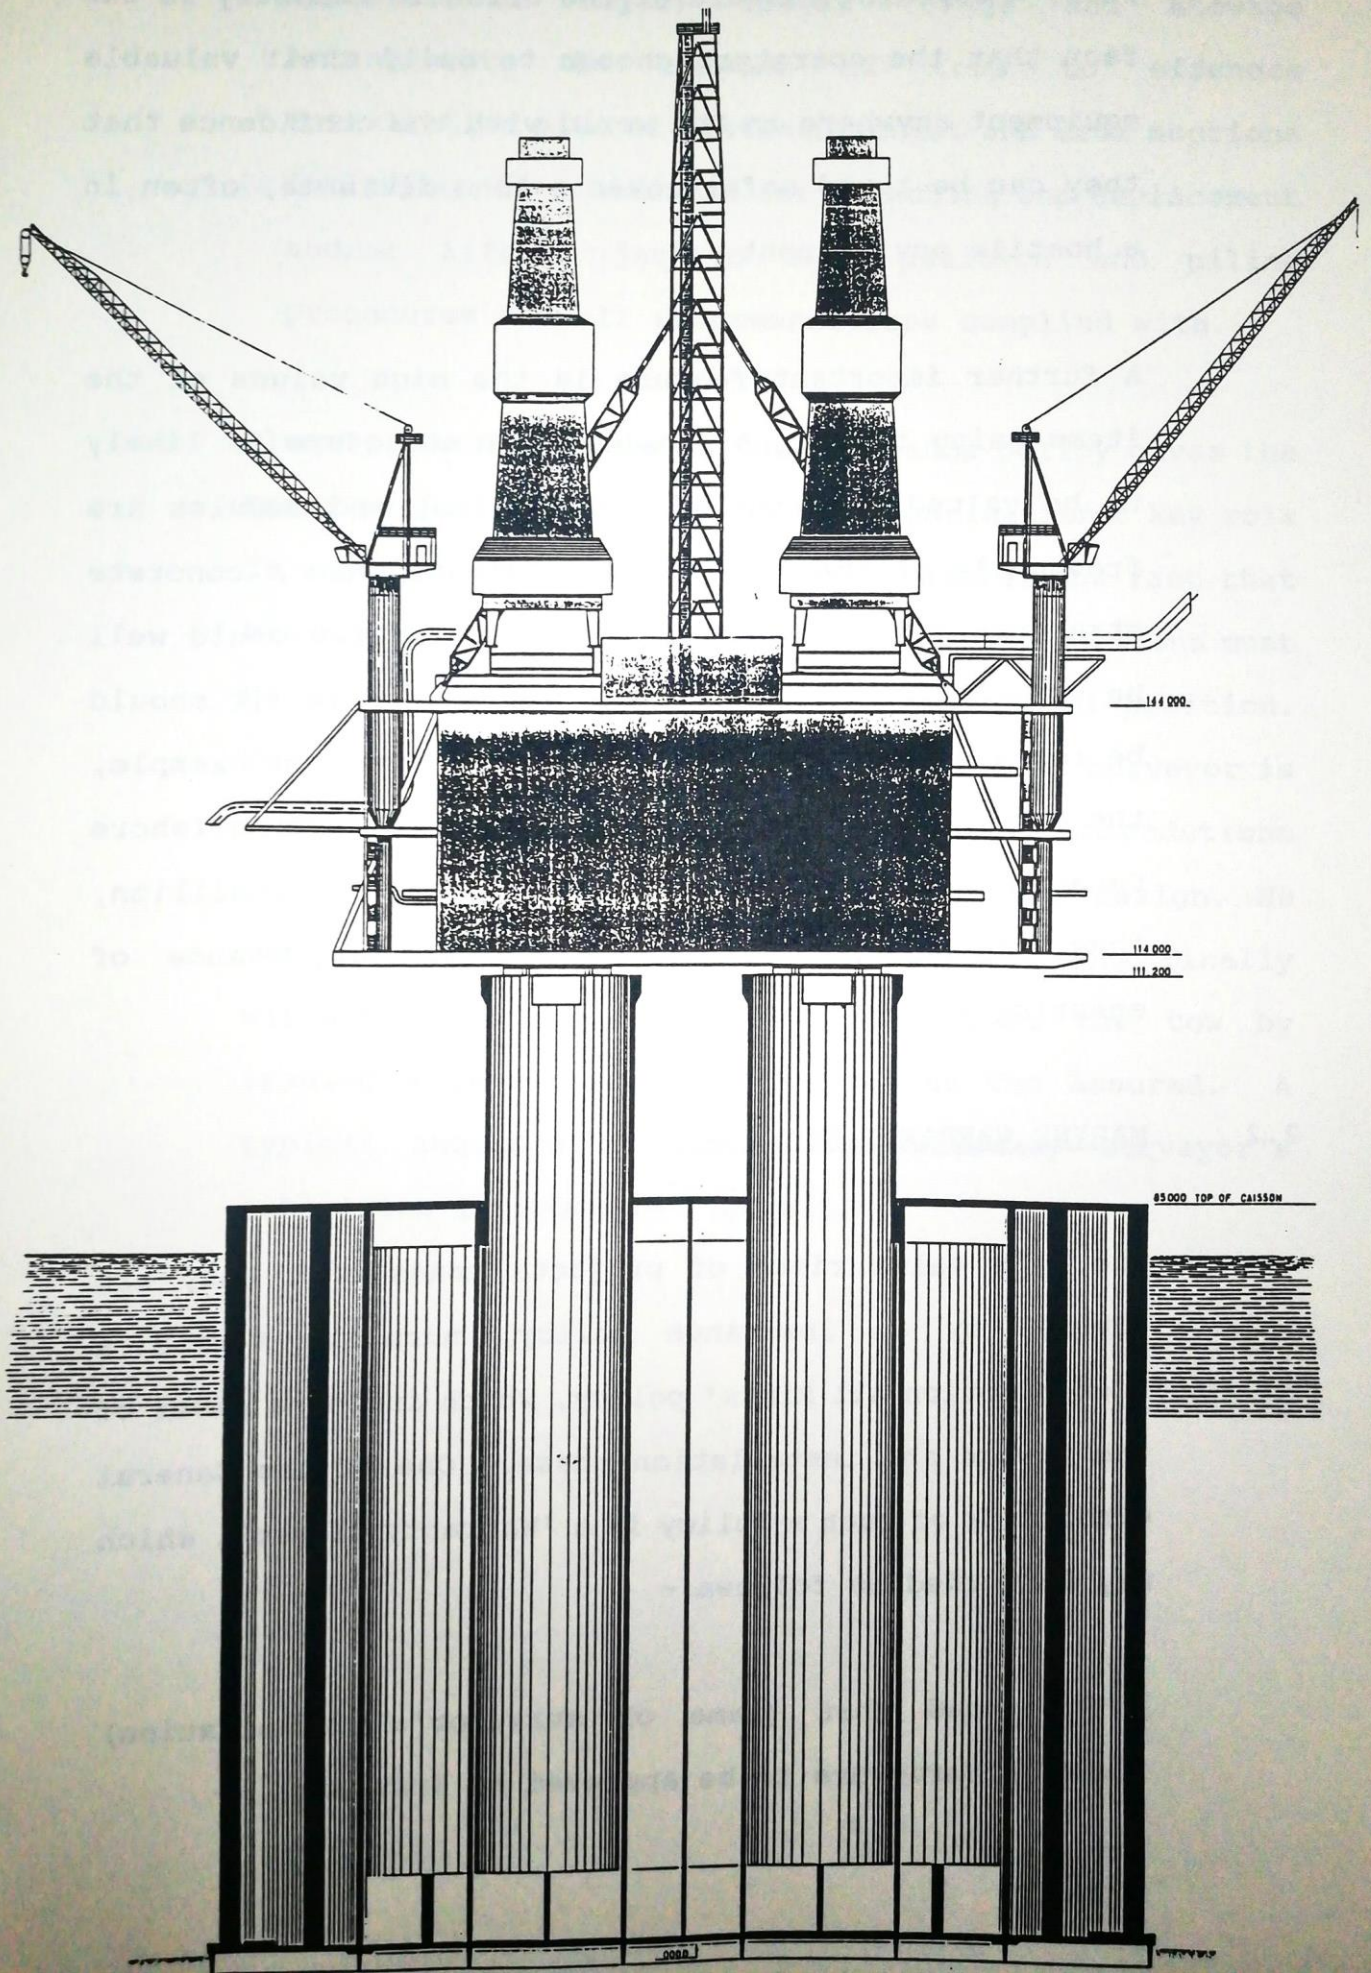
TYPICAL EXAMPLE OF OFFSHORE PLATFORM WITH CONCRETE SUBSTRUCTURE
